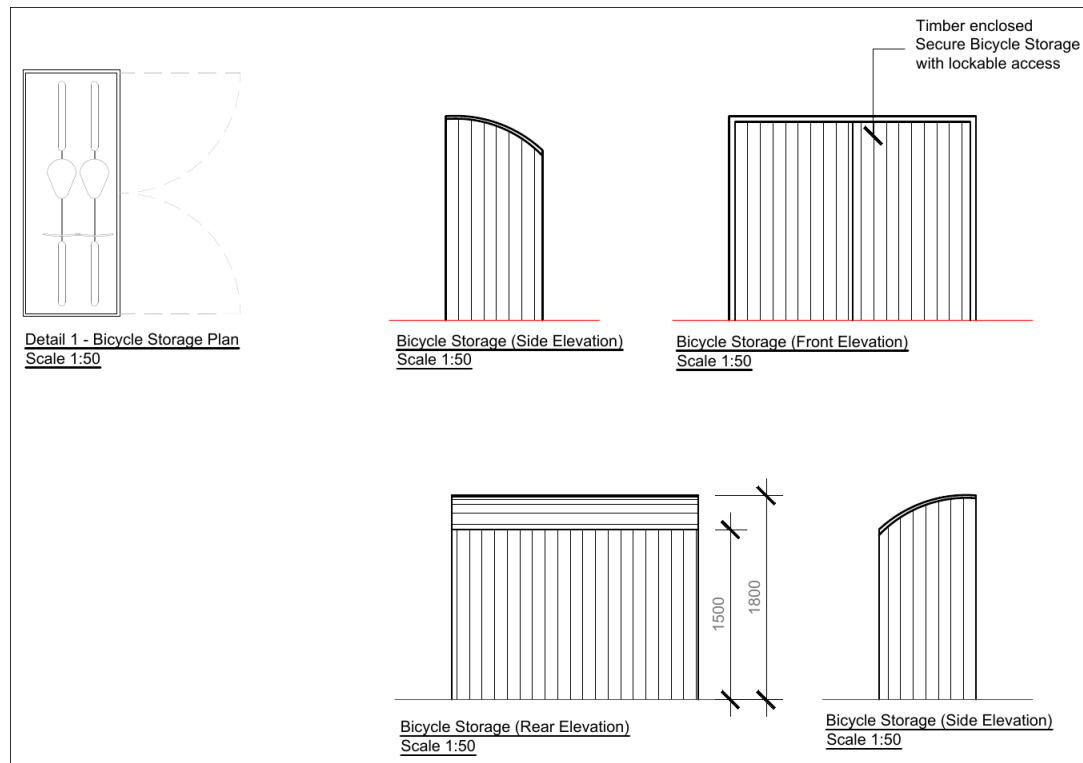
Secure timber cycle storage detail (extract from AVAN Plans Drawing A2010-07, Detail 1)
